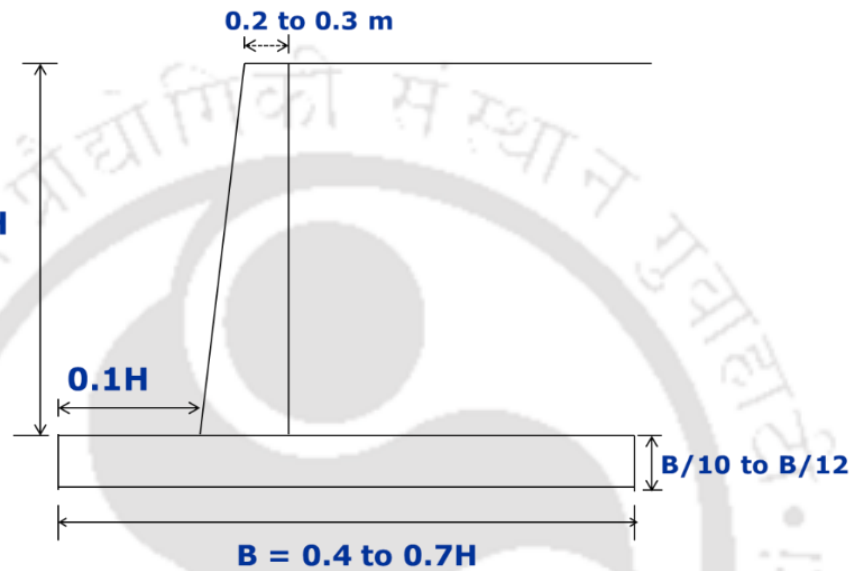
Tentative dimensions of cantilever retaining wall (after Bowles, 1988)
